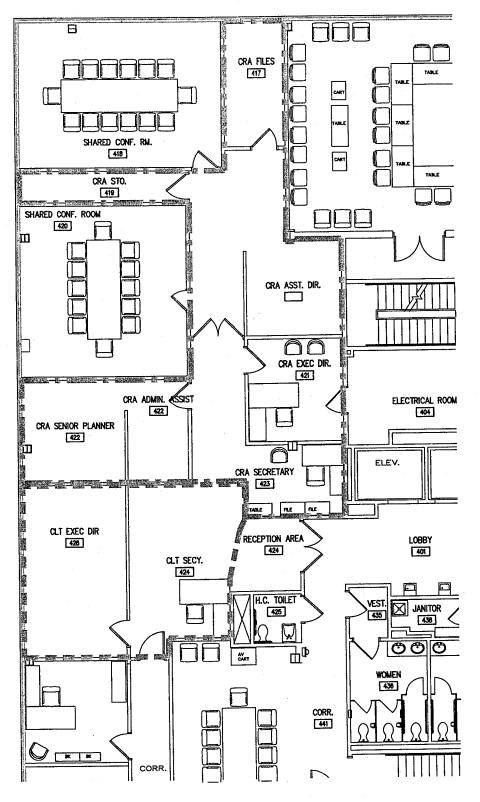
EXHIBIT "B" BLDG. 1, 4th FLOOR
